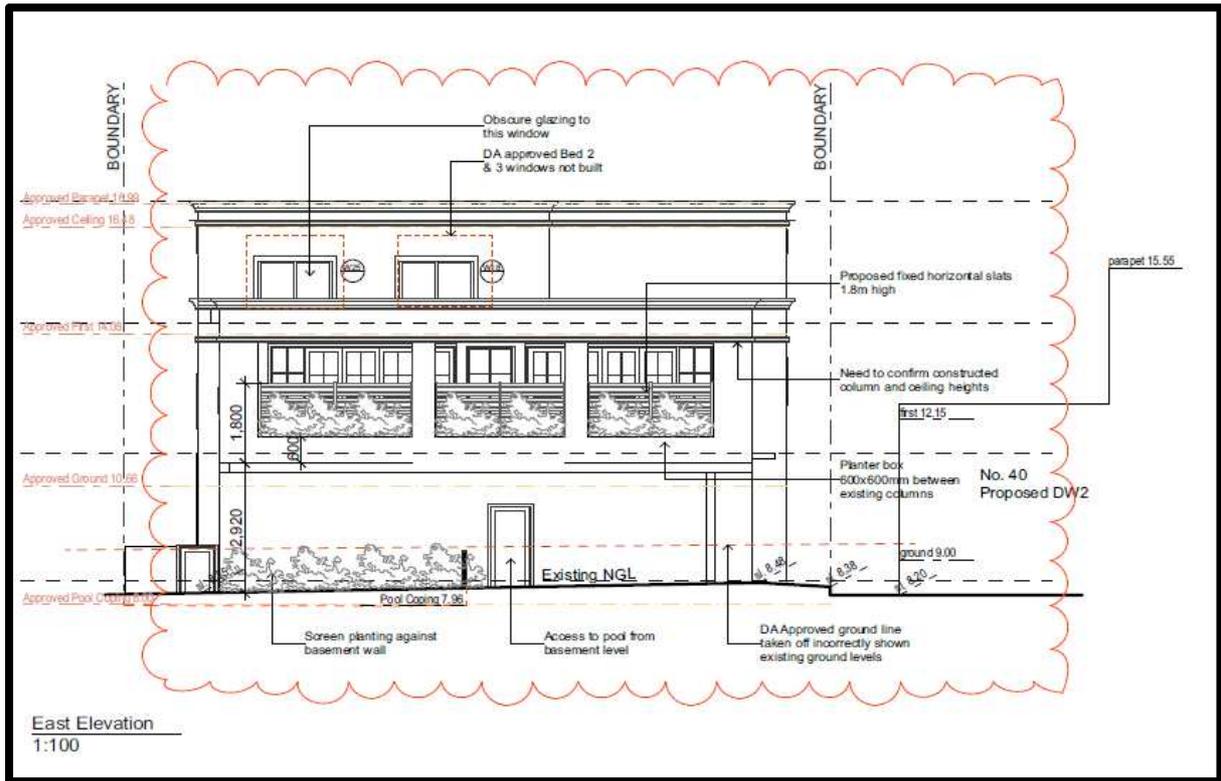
Extract of amended east rear elevation (Source: Gelder Architects, August 2019).
